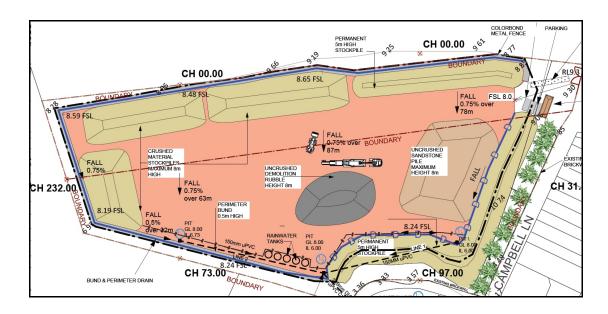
Extract from the plan of the final operational stage of the proposed development. Full details are provided on Drawing No.22, Issue E of the plans of the proposed development at Appendix 9.
